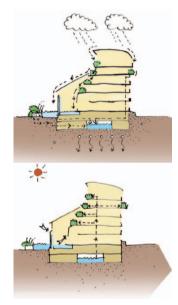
Irrigation of rain gardens and collection of rainwater during the rainy season (Above)
